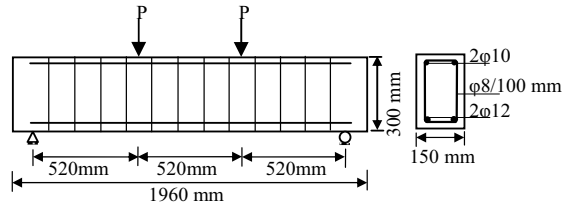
Geometry, arrangement of reinforcement and loading of the tested beams.
